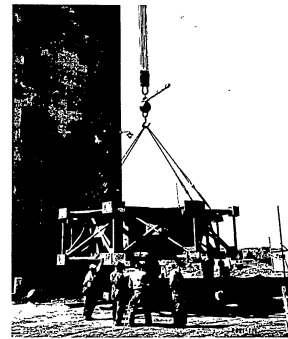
The hub weldment, which weighs 42,000 lb, is balanced and tagged prior to lifting to the tower roof.
